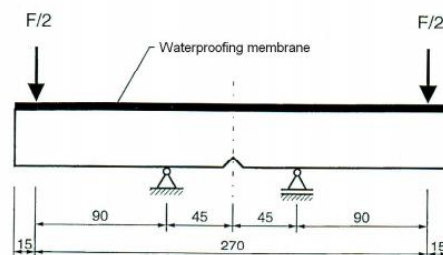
Test set-up for generating cracks by bending of test specimen.
